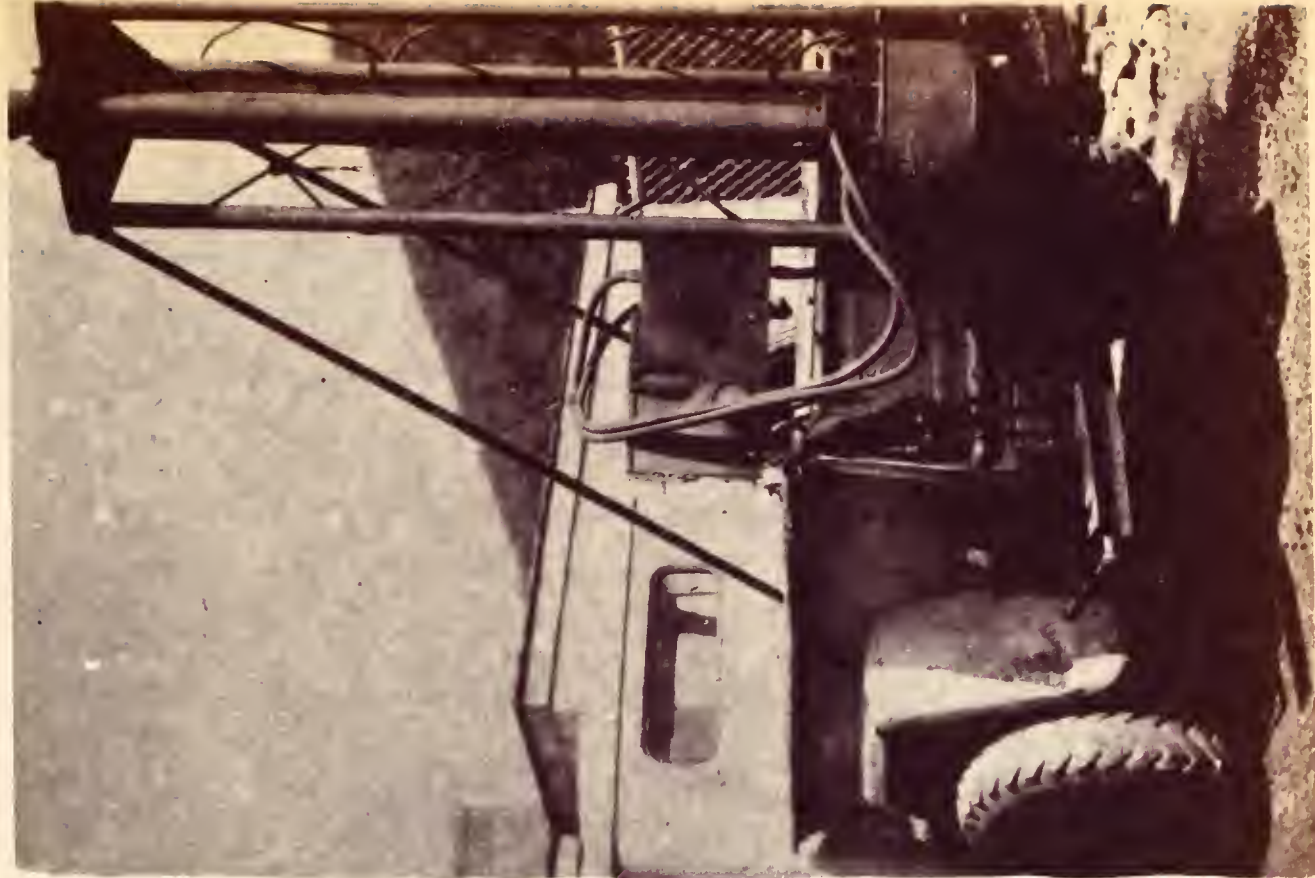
A CUTTER HEAD AND POWER AUGER USED ON TURNPIKE
